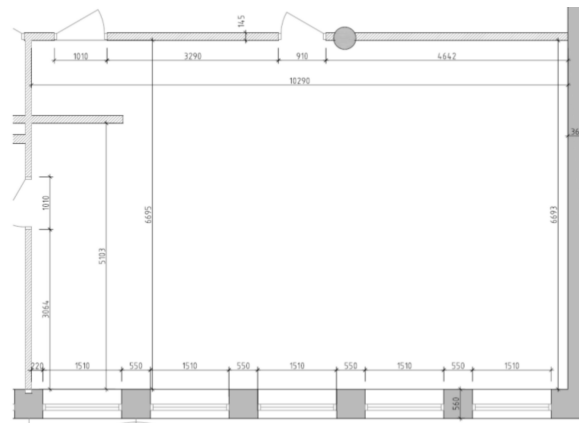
The representative room plan in Skelleftea school, Sweden.
